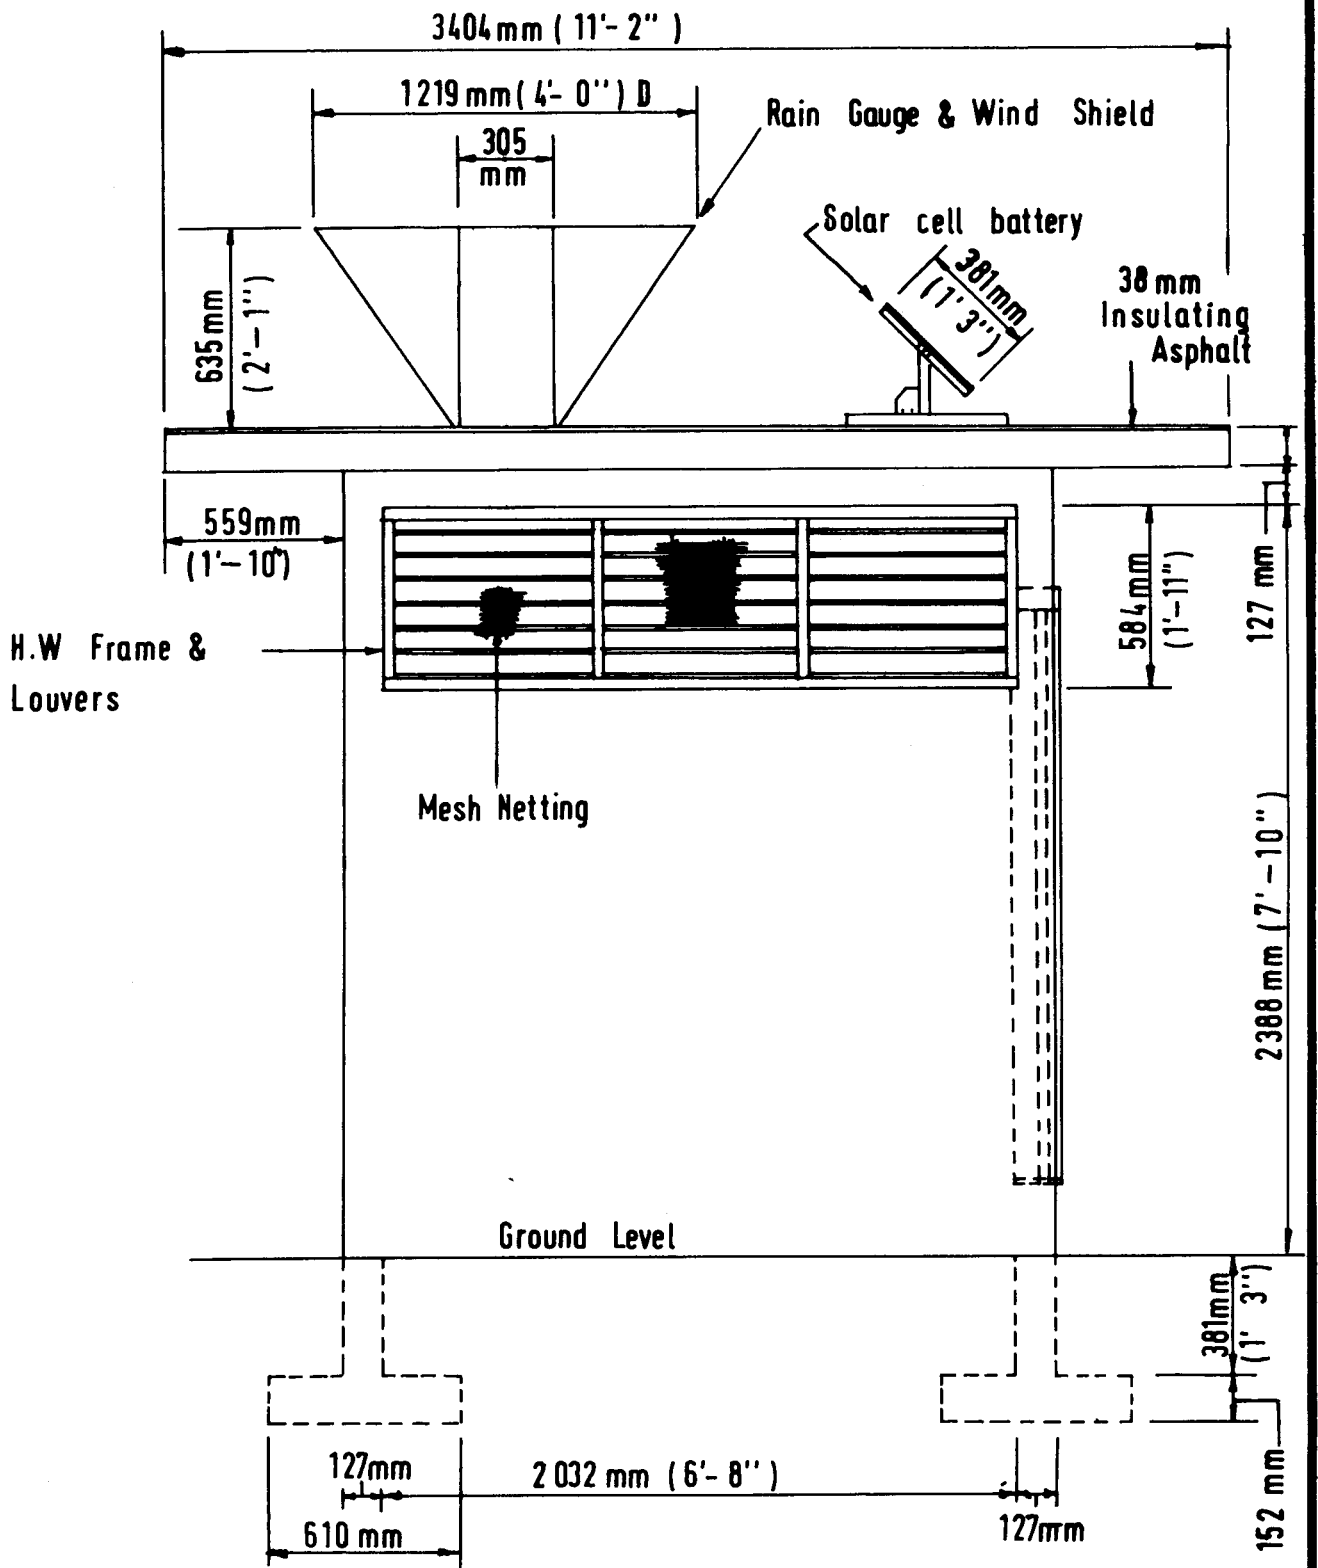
RAINGAUGE INSTALLED ON ROOFTOP OF TELEMETERING STATION
